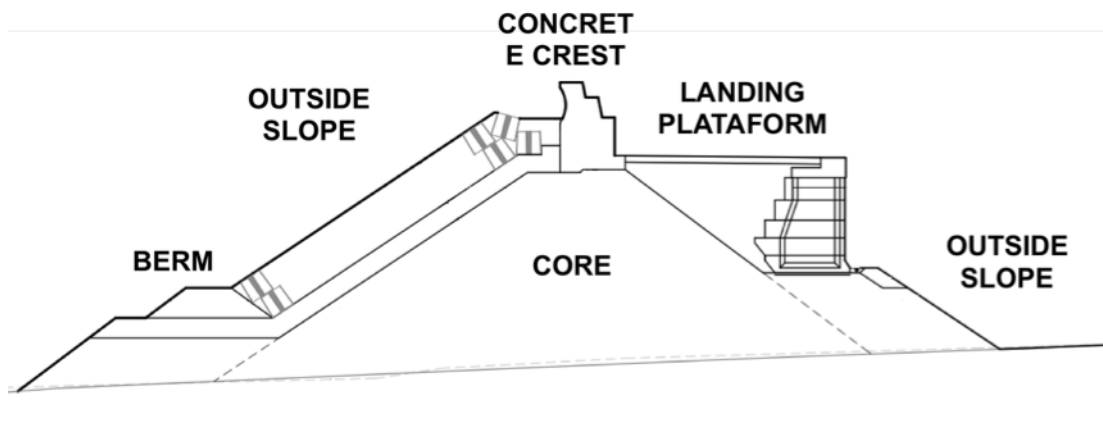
Generic cross-section of the structure, adapted from CONSULMAR (2010a)
